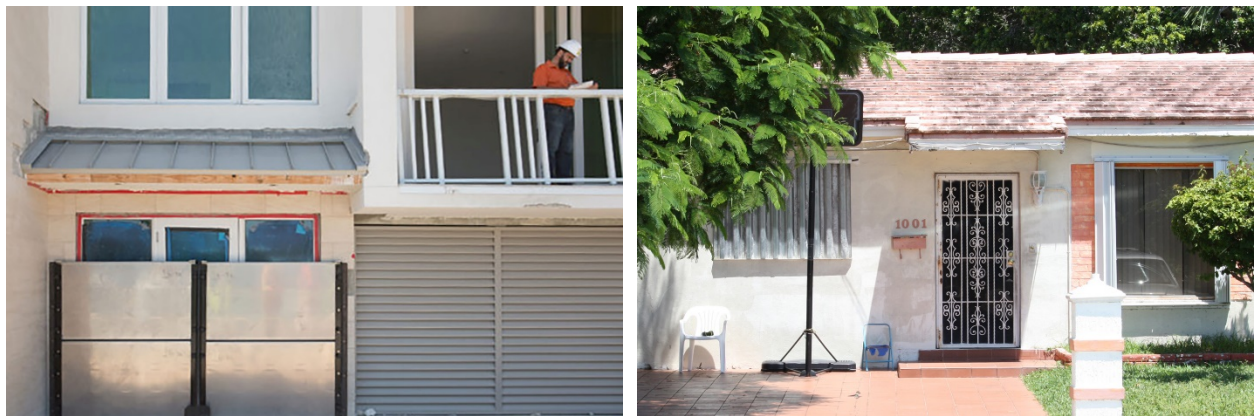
Building reinforcement by installing hurricane shutters and storm panels.
